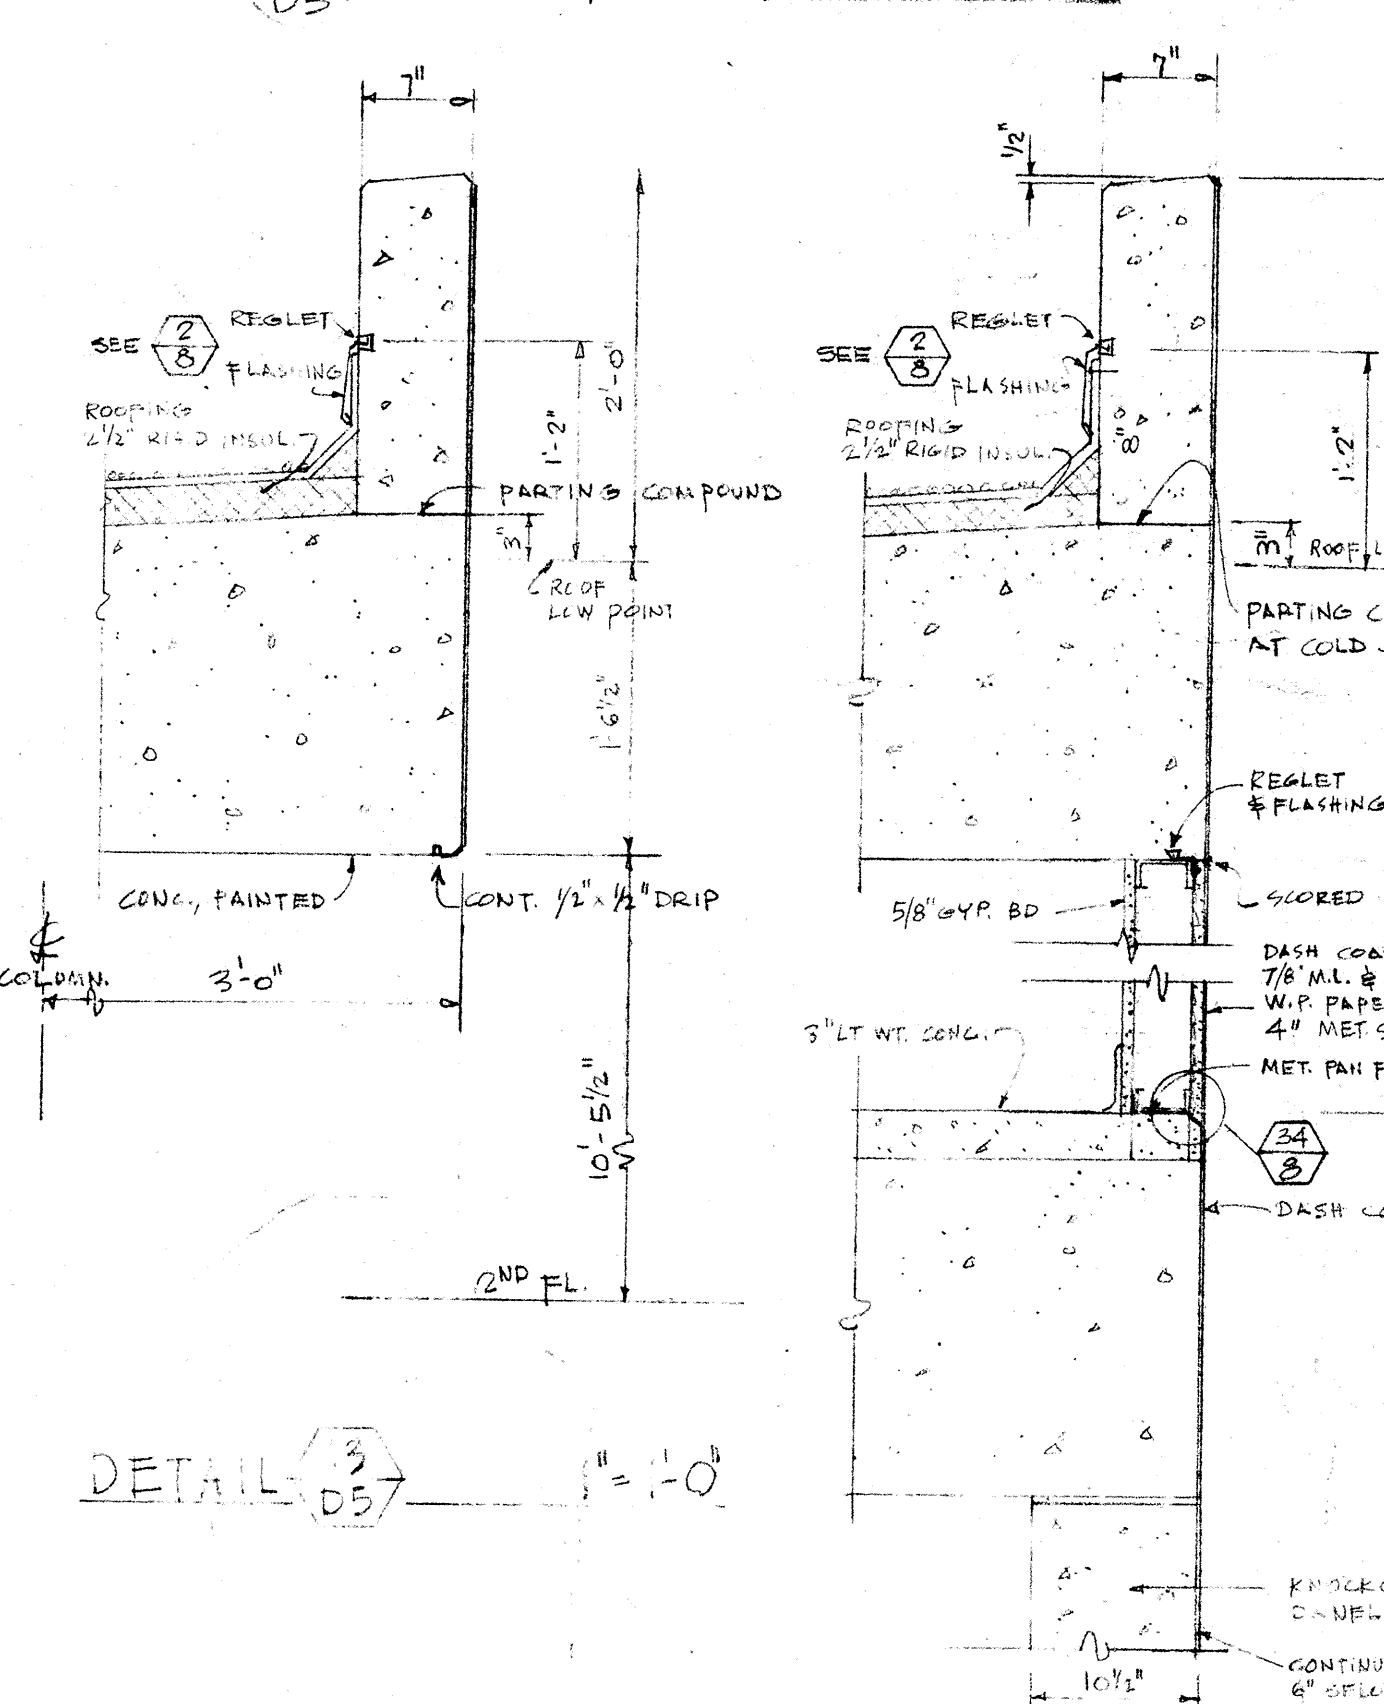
/DS 1" = 1'-0" DETAIL 4/DS 1" = 1'-0"
